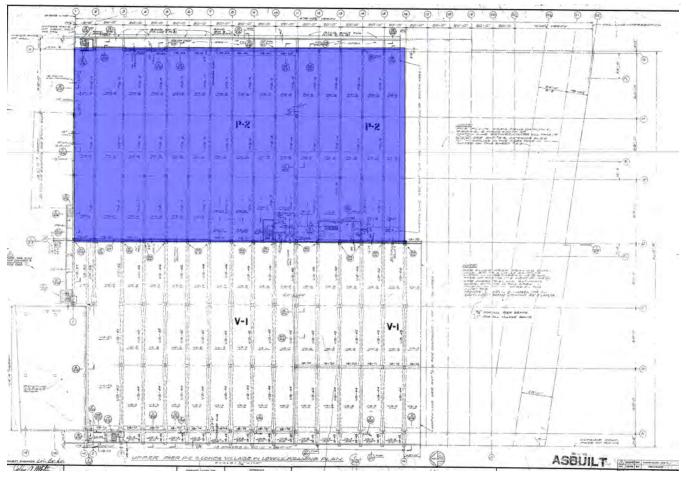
Proposed new traffic membrane and existing traffic membrane locations, Partial South Parking Pier Structure- Pier level
